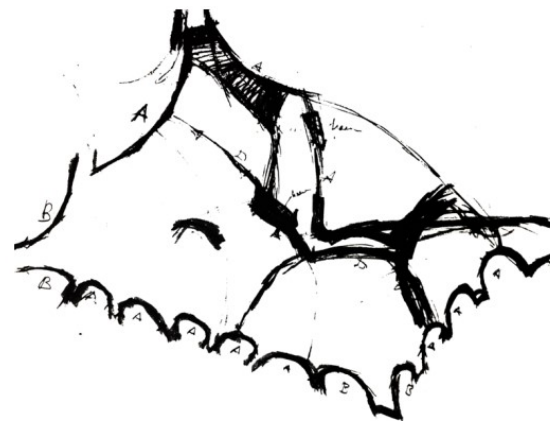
"shape element method" for the wall structures of Kaleva Church (1966)
